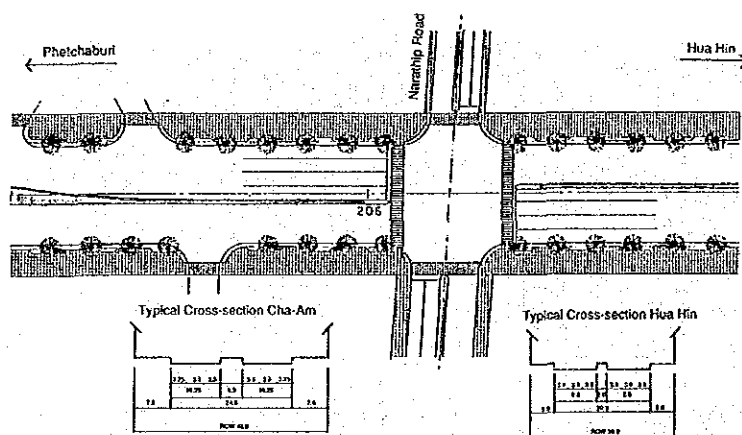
Improvement Plan of Phet Kasem Road
